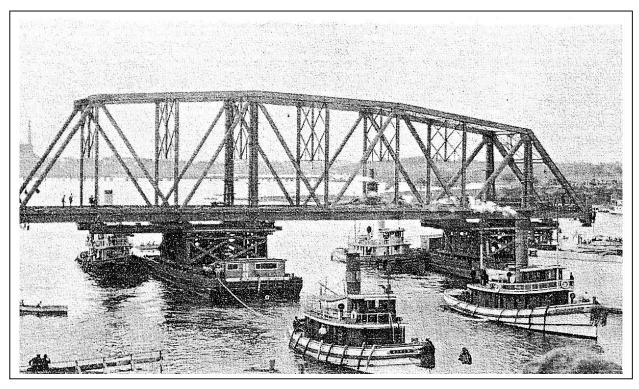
Portsmouth span in transit, note left two panels missing and barge closer to center of truss (Dufresne 1961:17)
